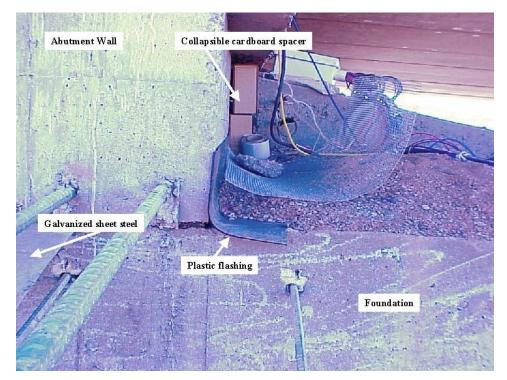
This picture shows the galvanized sheet steel between the abutment wall and the foundation, and the plastic flashing and collapsible cardboard spacer in front of the bottom of the abutment wall. Following this stage is placement of the concrete slope paving cap between the top of the front MSE wall and the base of the abutment wall.
